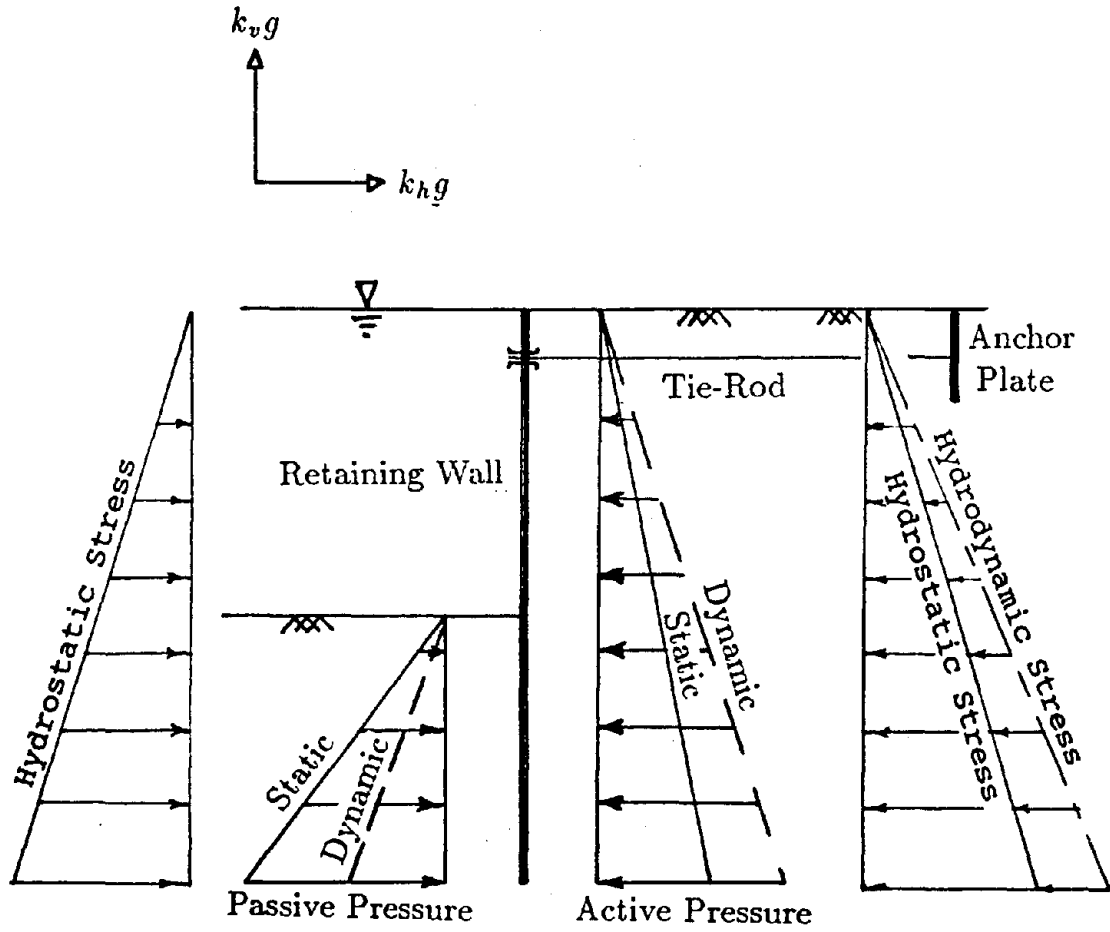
Water and Earth Pressures in a Tied-Back Wall System
